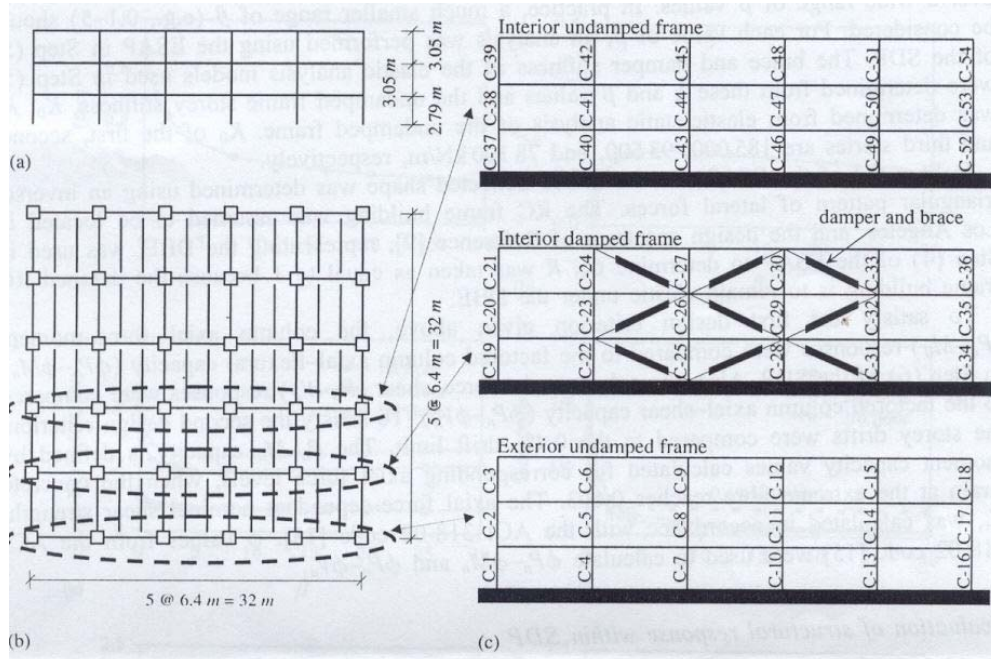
Prototype non-ductile RC frame building and analytical: (a) elevation view; (b) plan view (c) damper configuration and analytical model
